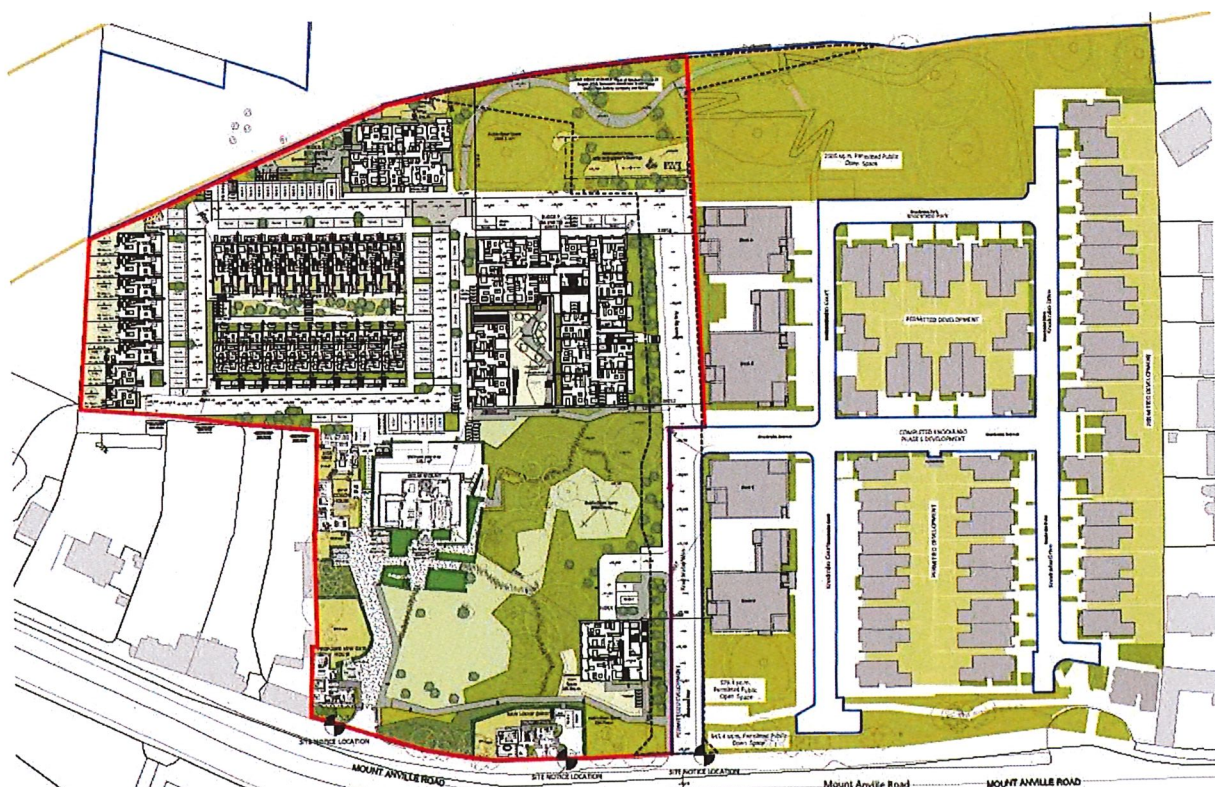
Proposed site plan. Source: O'Mahony Pike Architects
